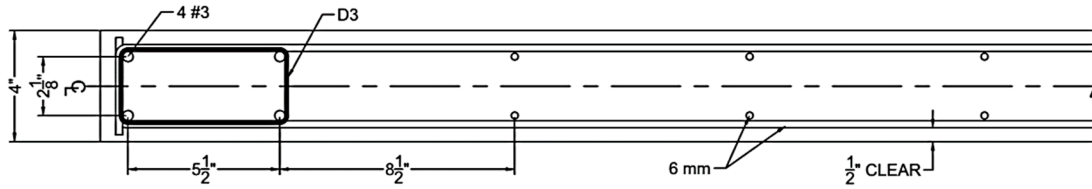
Shear Wall Specimen R1 – Cross Section (Oesterle et al. 1976)
